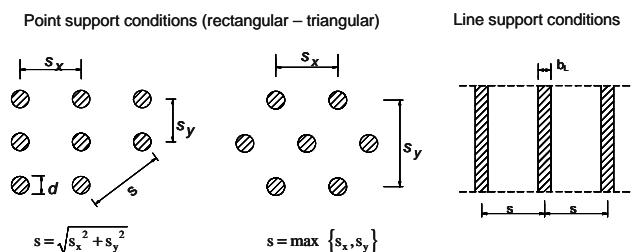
Geosynthetic-reinforced pile-supported embankment
